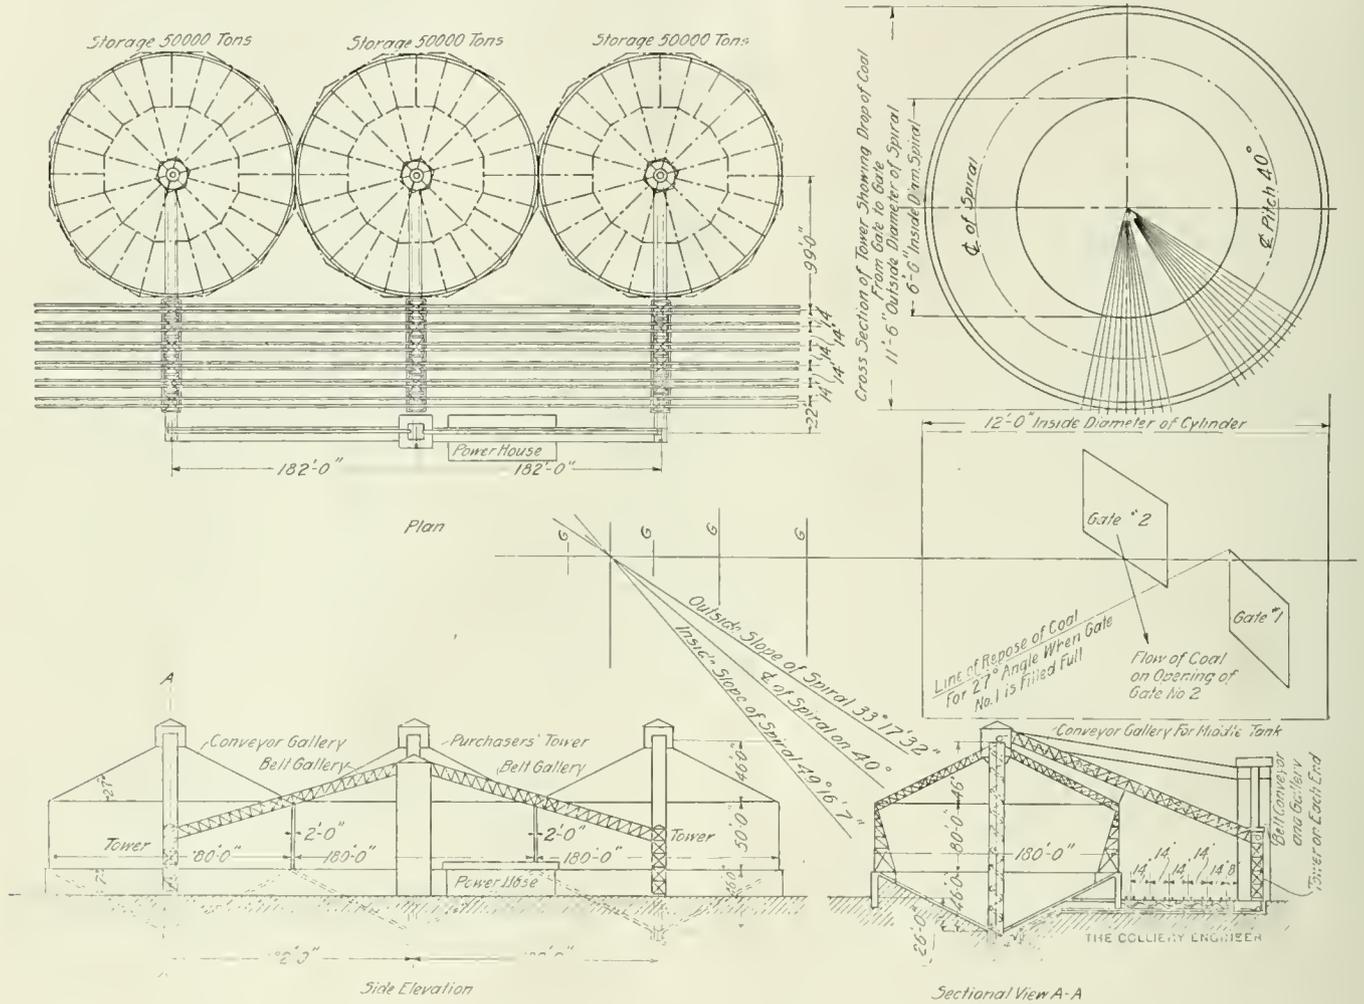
PLAN AND ELEVATIONS OF COAL STORAGE APPARATUS
